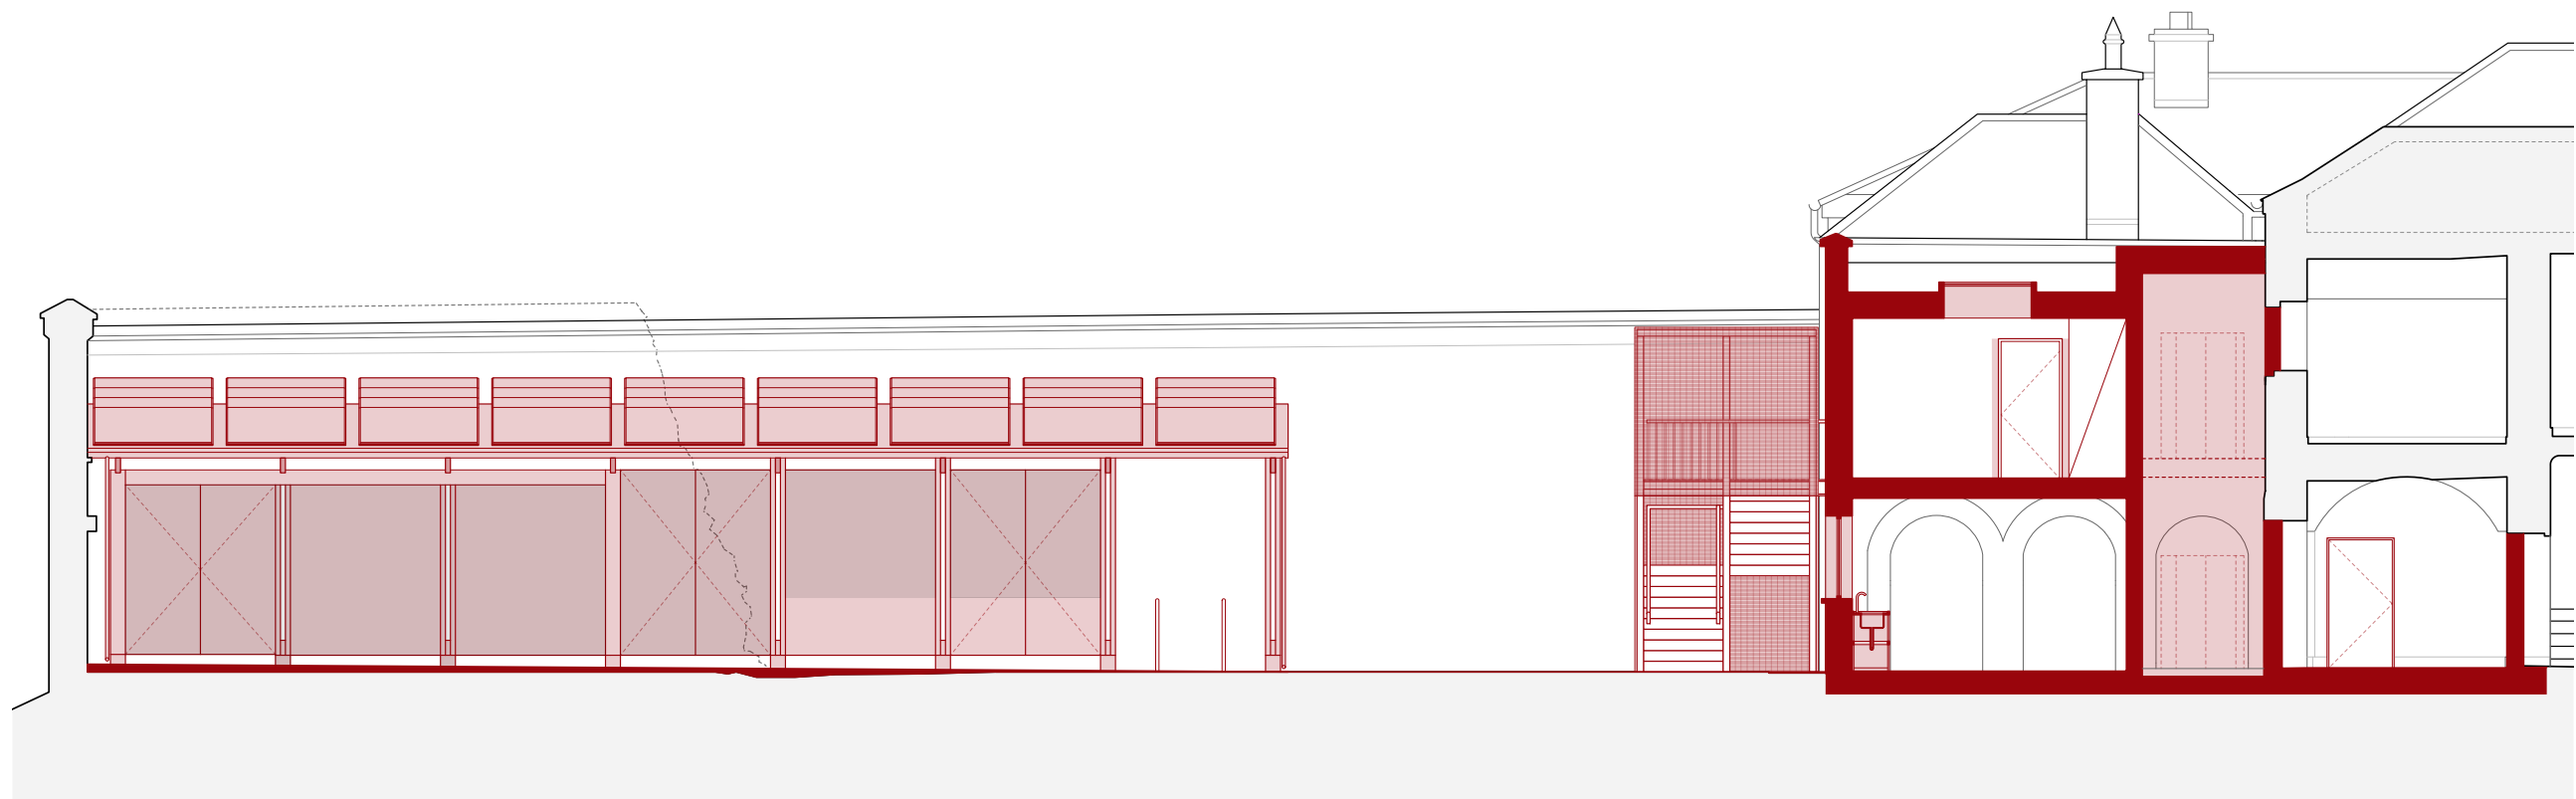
Section through the rear yard and building showing the new store and escape stair
